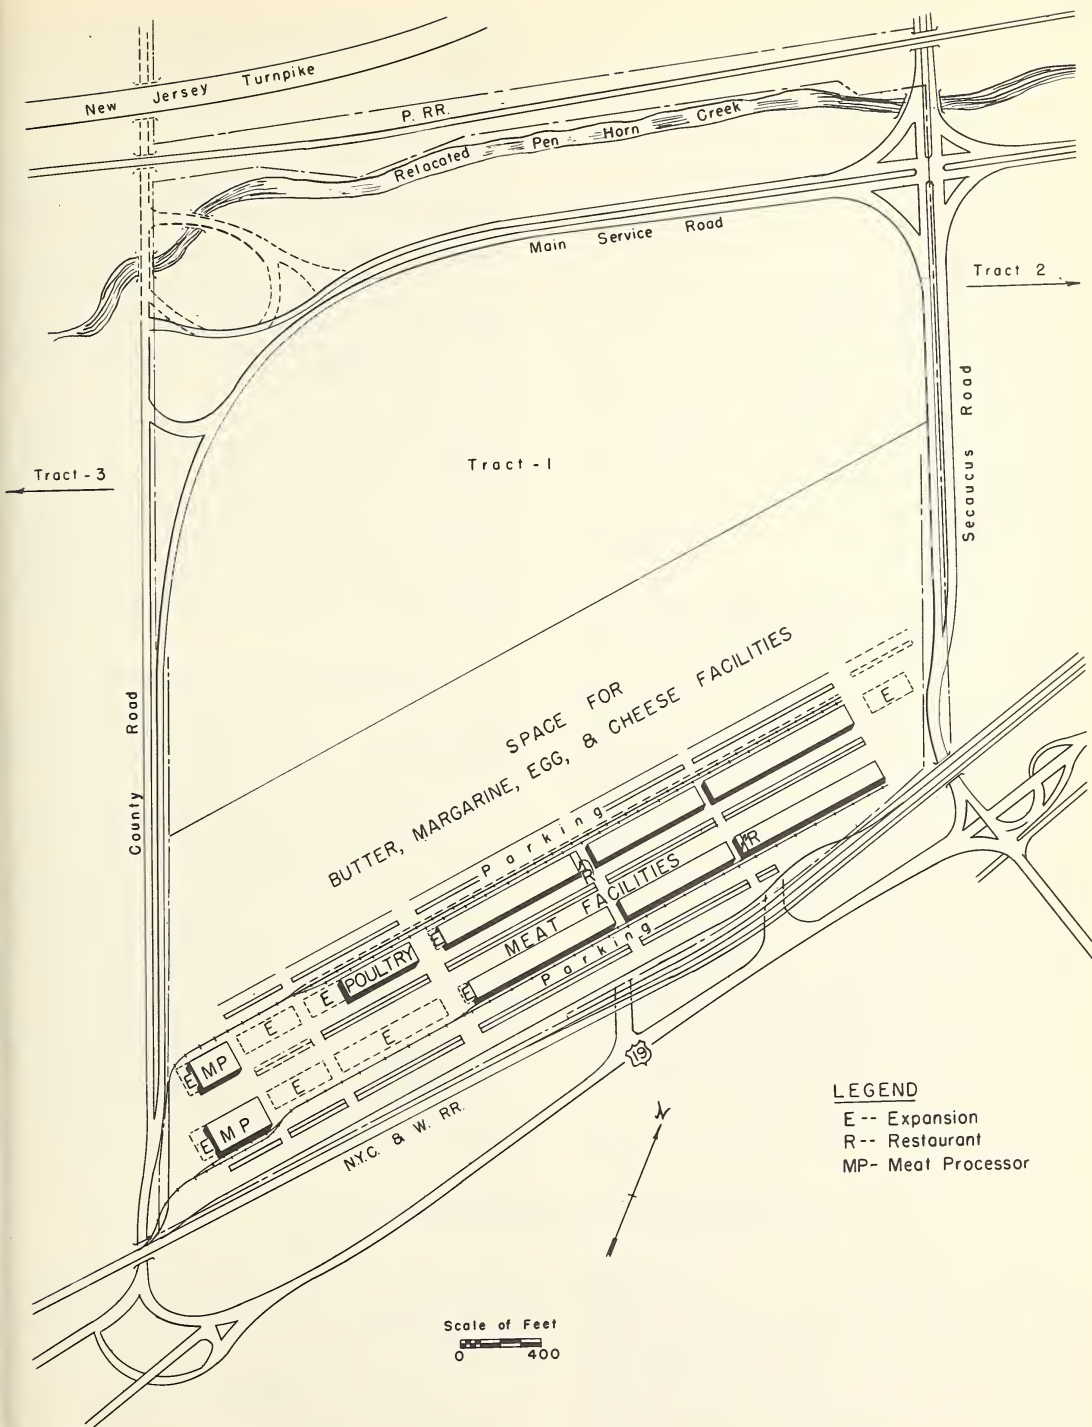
A possible layout of facilities for a wholesale meat and poultry market at Jersey Meadows, New Jersey, to serve New York City.
